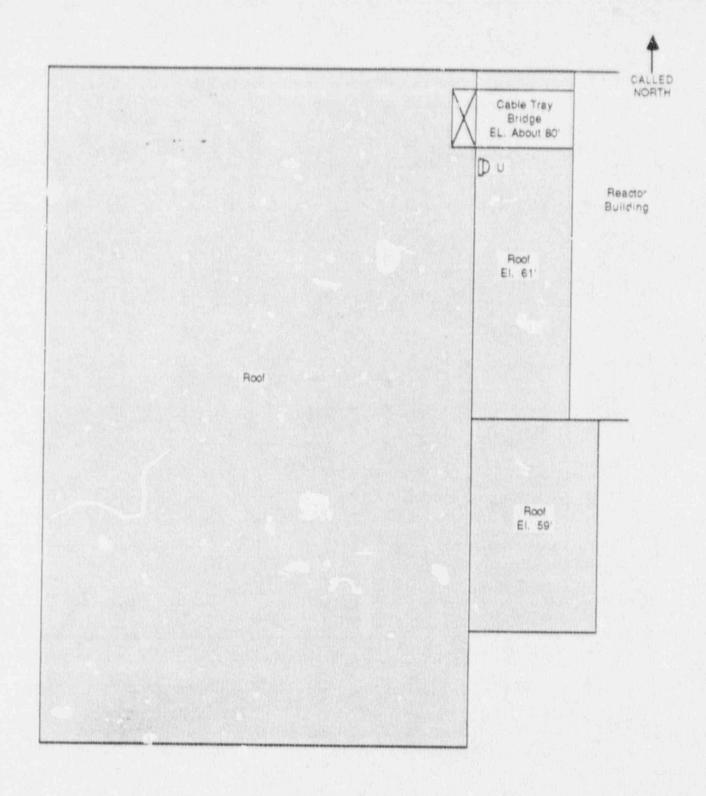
Oyster Creek Turbine and Office Buildings - Roof Elevations
